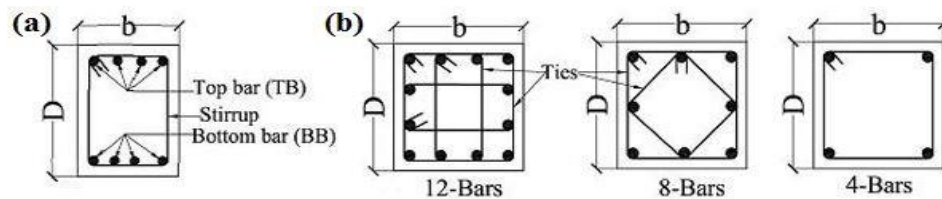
(a) Typical beam cross section showing top and bottom reinforcement of beam and (b) column cross sections with a different number of reinforcement bars.
